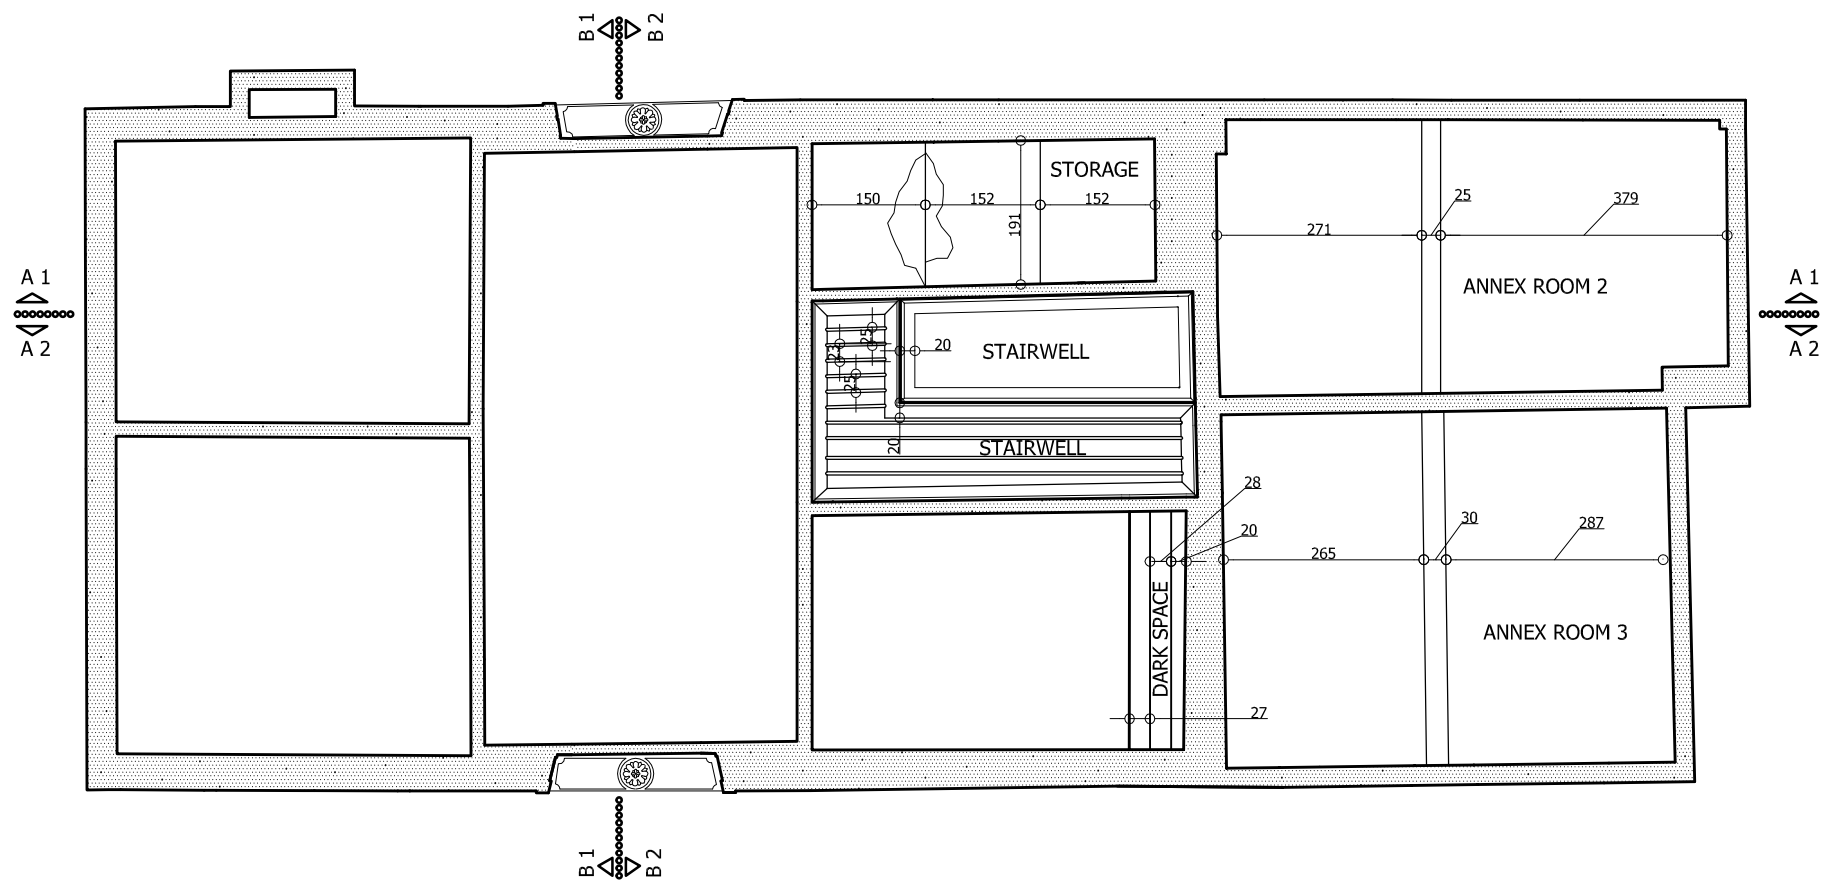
Measured Drawings- Ground Floor Ceiling Plan
